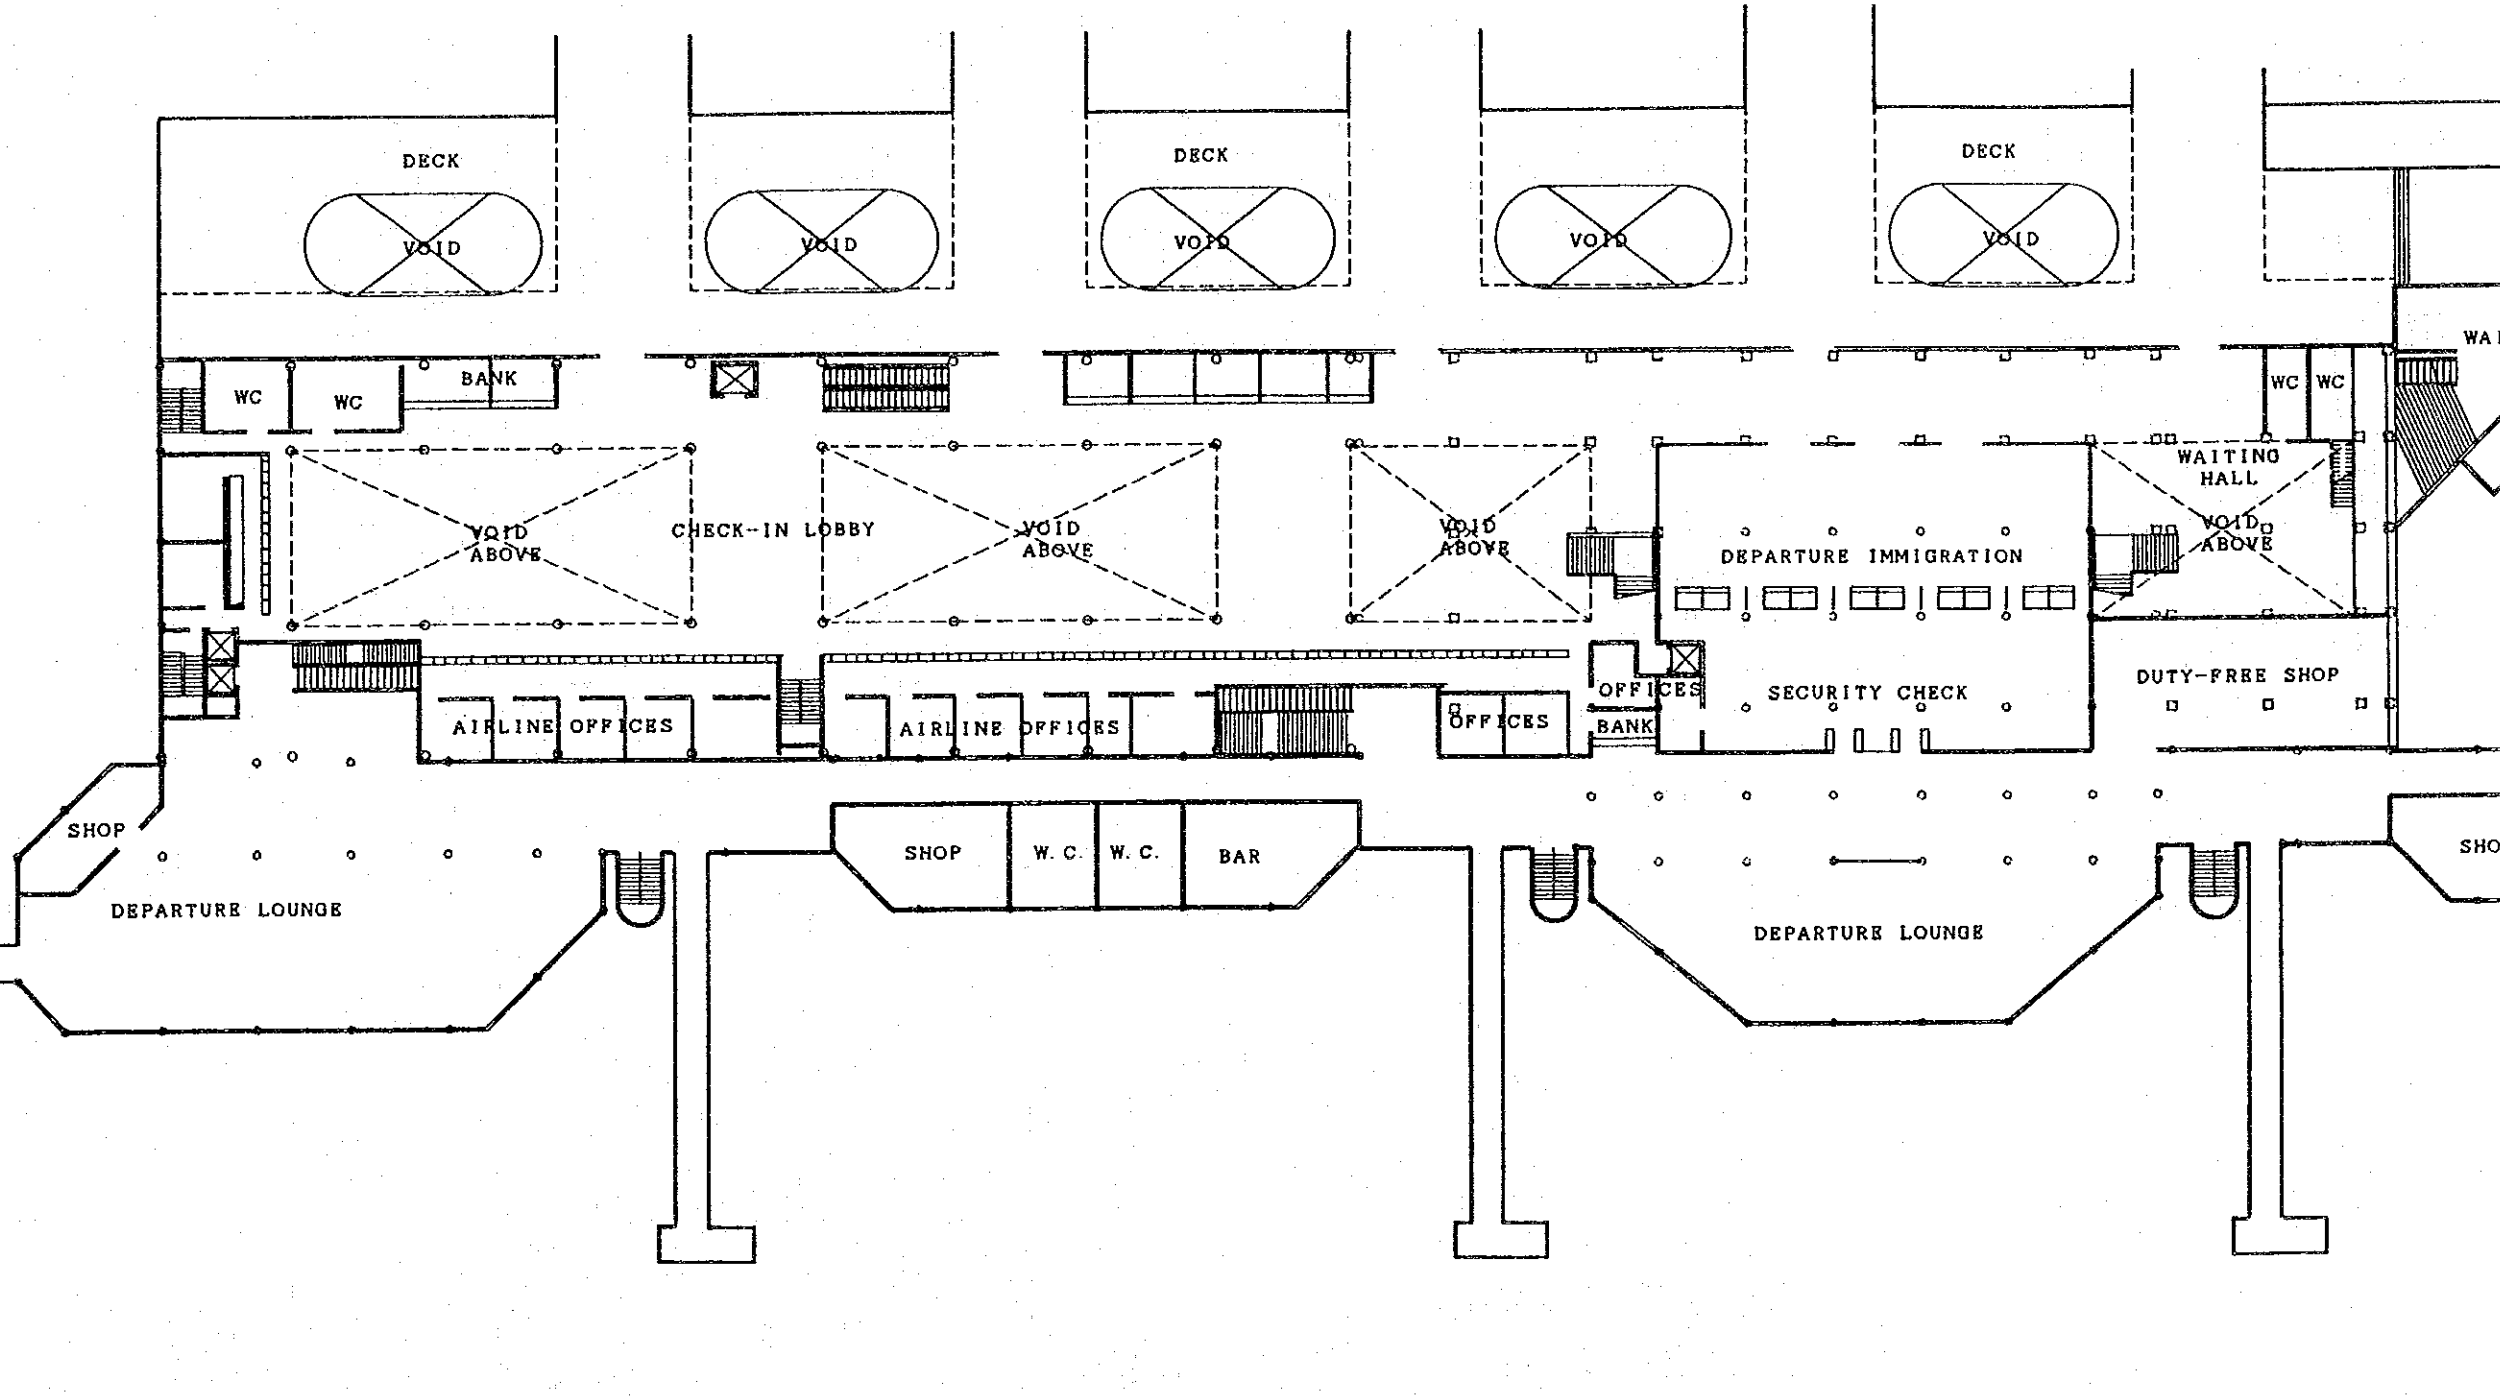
Layout Plan of International Passenger Terminal Building (Basement Floor)
